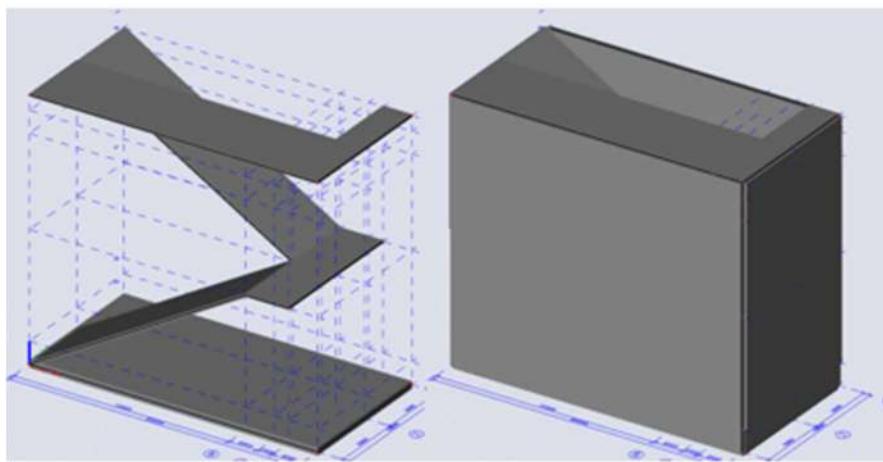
Simplified model stairwell, staircase (left) and walls (right)
